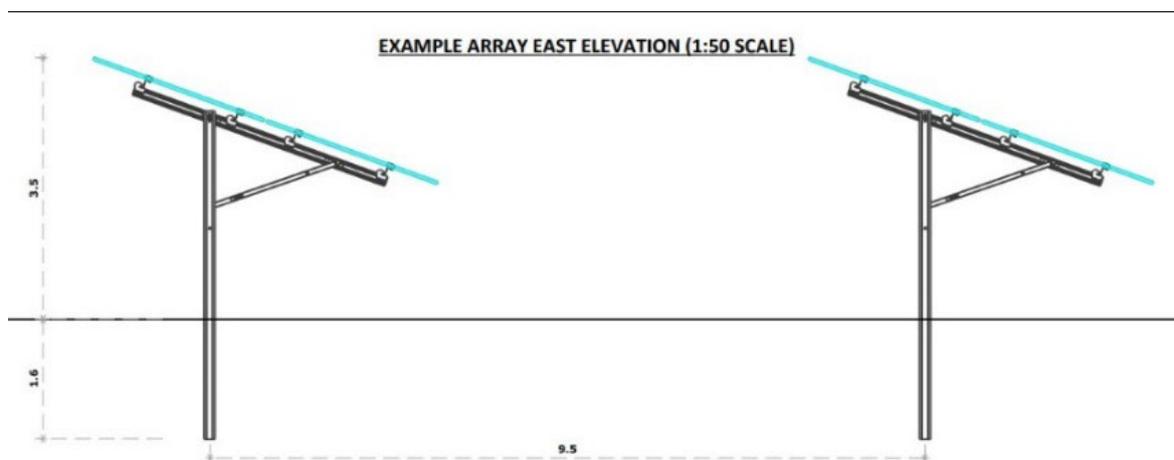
Proposed Elevation Layout (sheep grazing to remain in between arrays)
